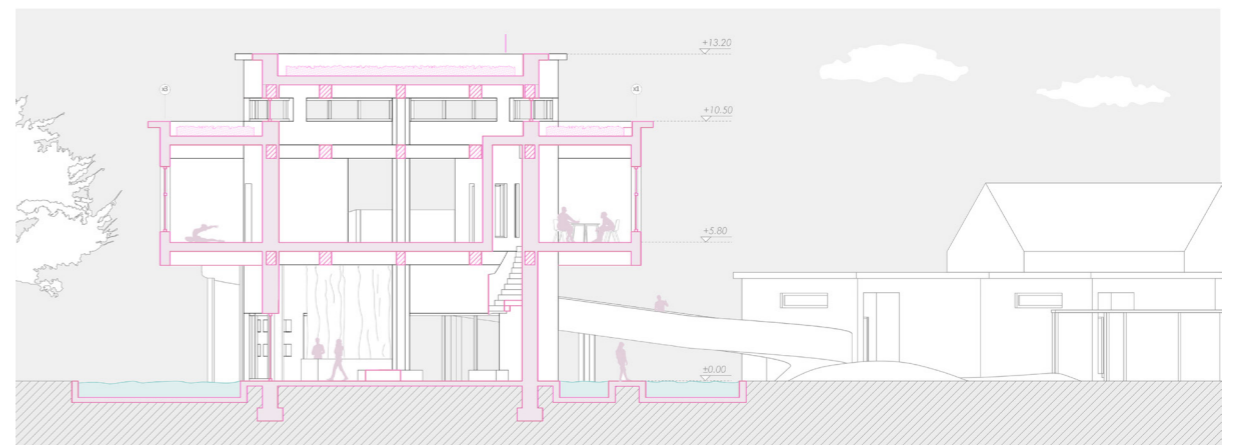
Section of the Unplug Space, showing the tearoom on the ground floor and the yoga space and therapy room on the first floor.
